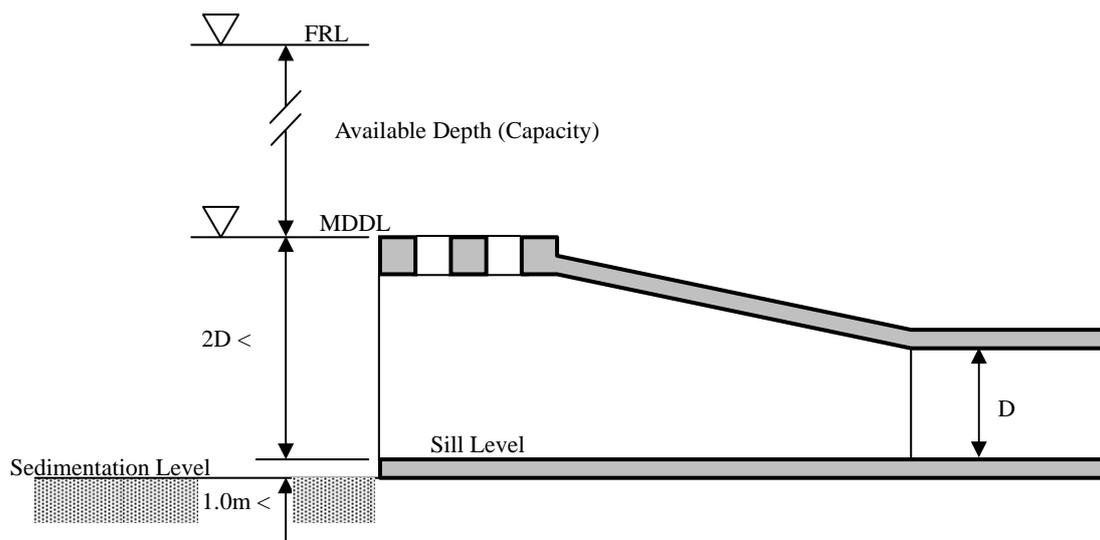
Structure Setting Elevation and Water Depth
